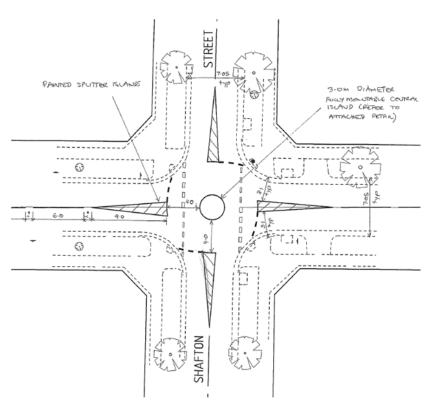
Plan drawing of mini-roundabout (Source: Tillotson 2015)
